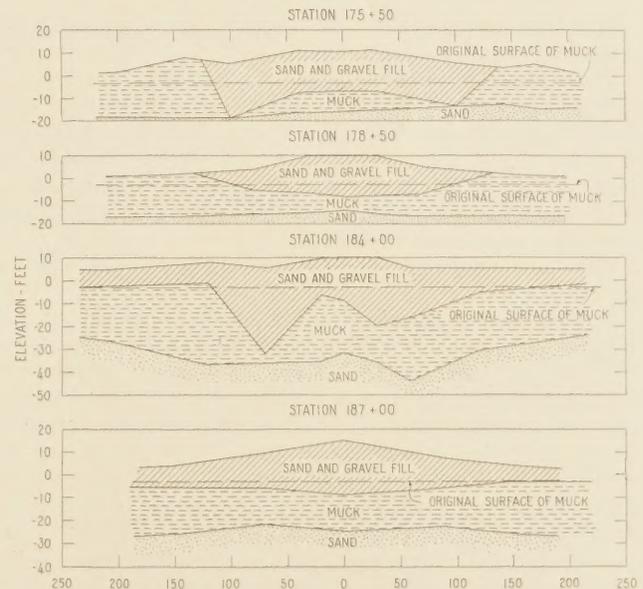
CROSS SECTIONS OF FILL AS INDICATED BY BORINGS.
